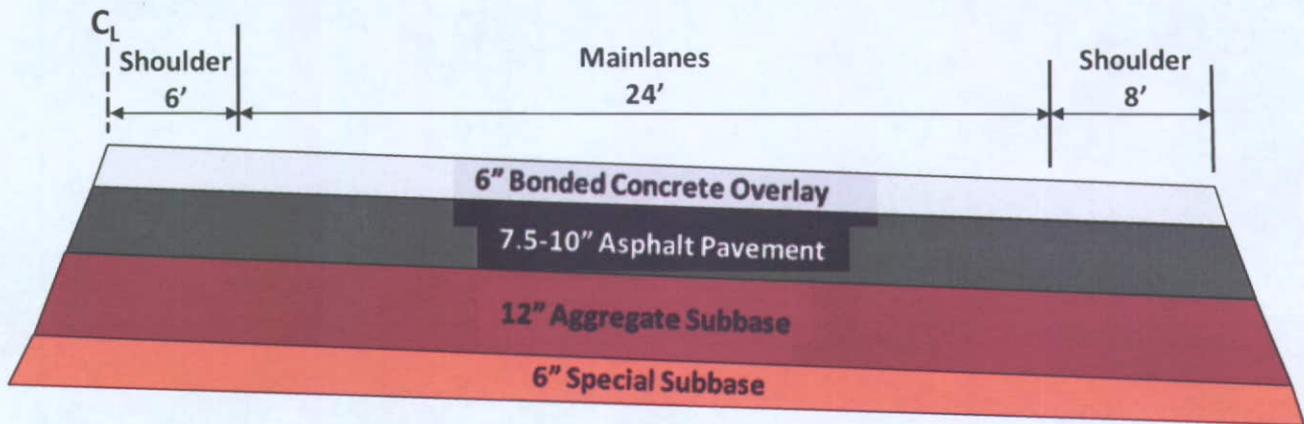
Bonded Concrete Overlay Typical 1/2 Section (composite section not shown)
